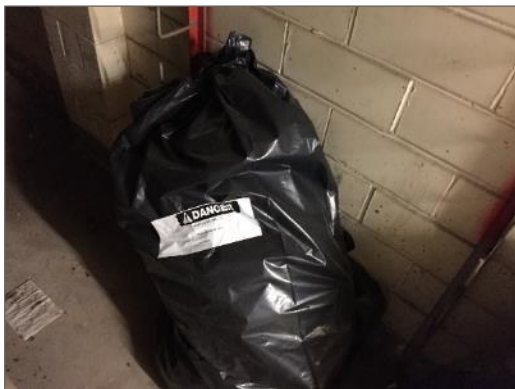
Garbage bag with asbestos waste label, Small Room in South Storage Room, M Wing Basement.
